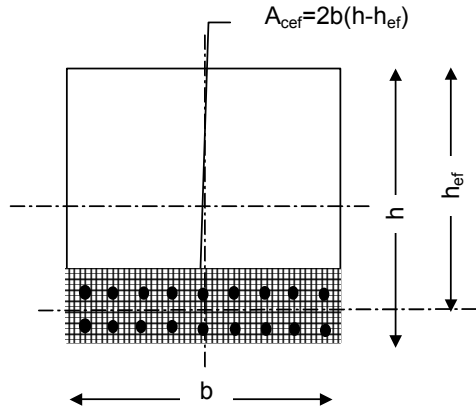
Active concrete area in tension zone for calculation of crack-width
